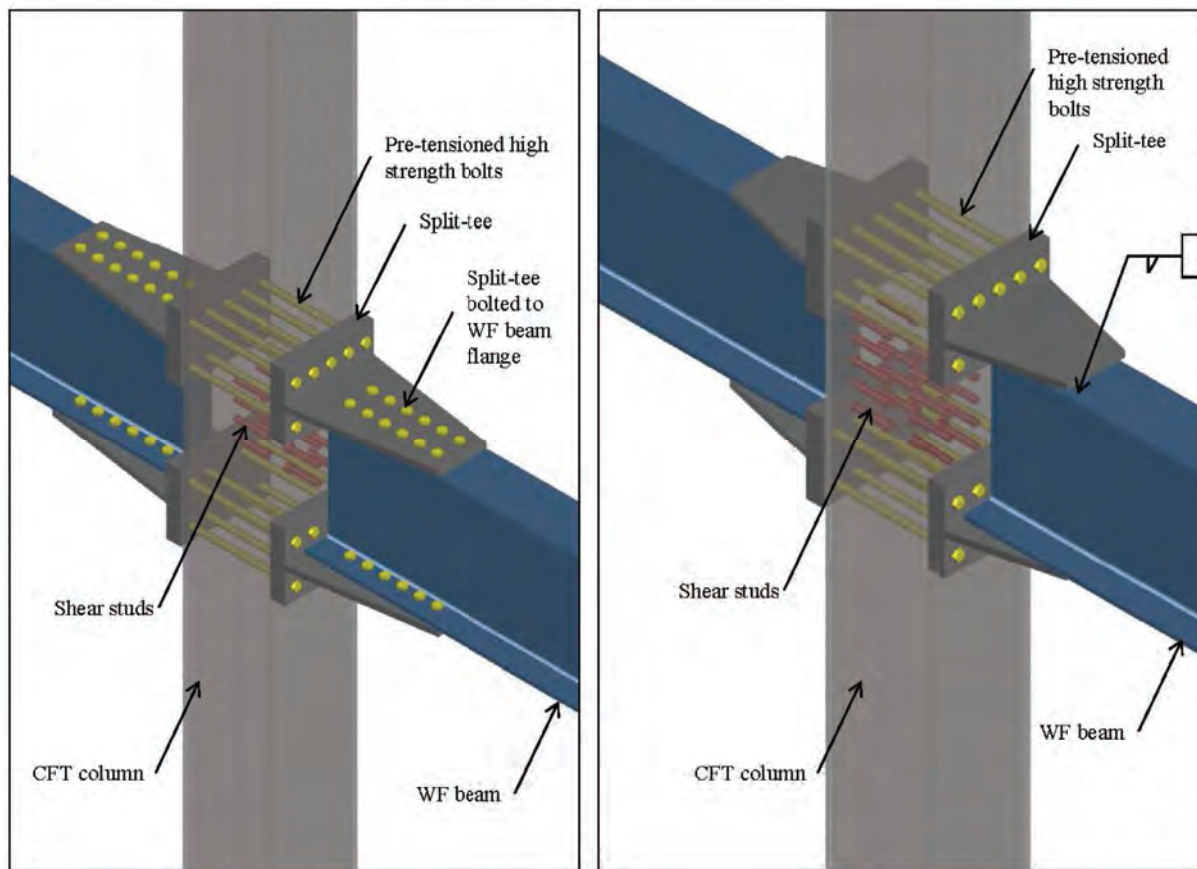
Split-tee connection schematic of WF beam to CFT column (columns shown as transparent): (a) bolted split-tee connection; (b) welded split-tee connection.
